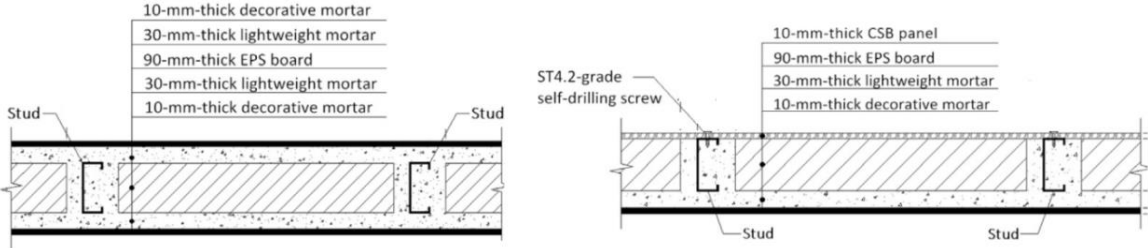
Details of wall specimens with SLM in one and both sides [17]
